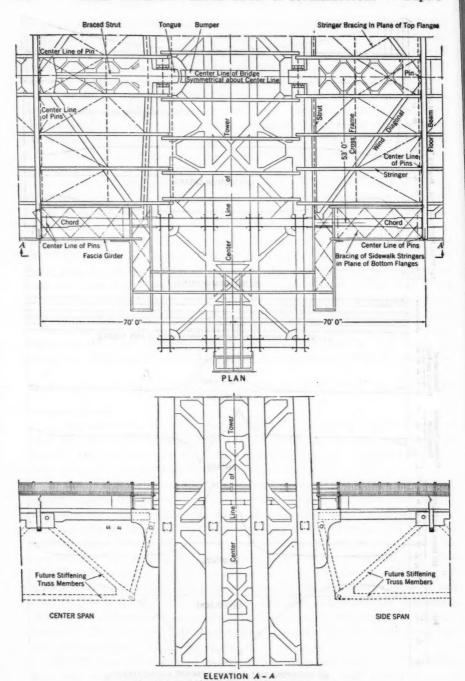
FLOOR FRAMING AT TOWER, GENERAL PLAN AND ELEVATION.
